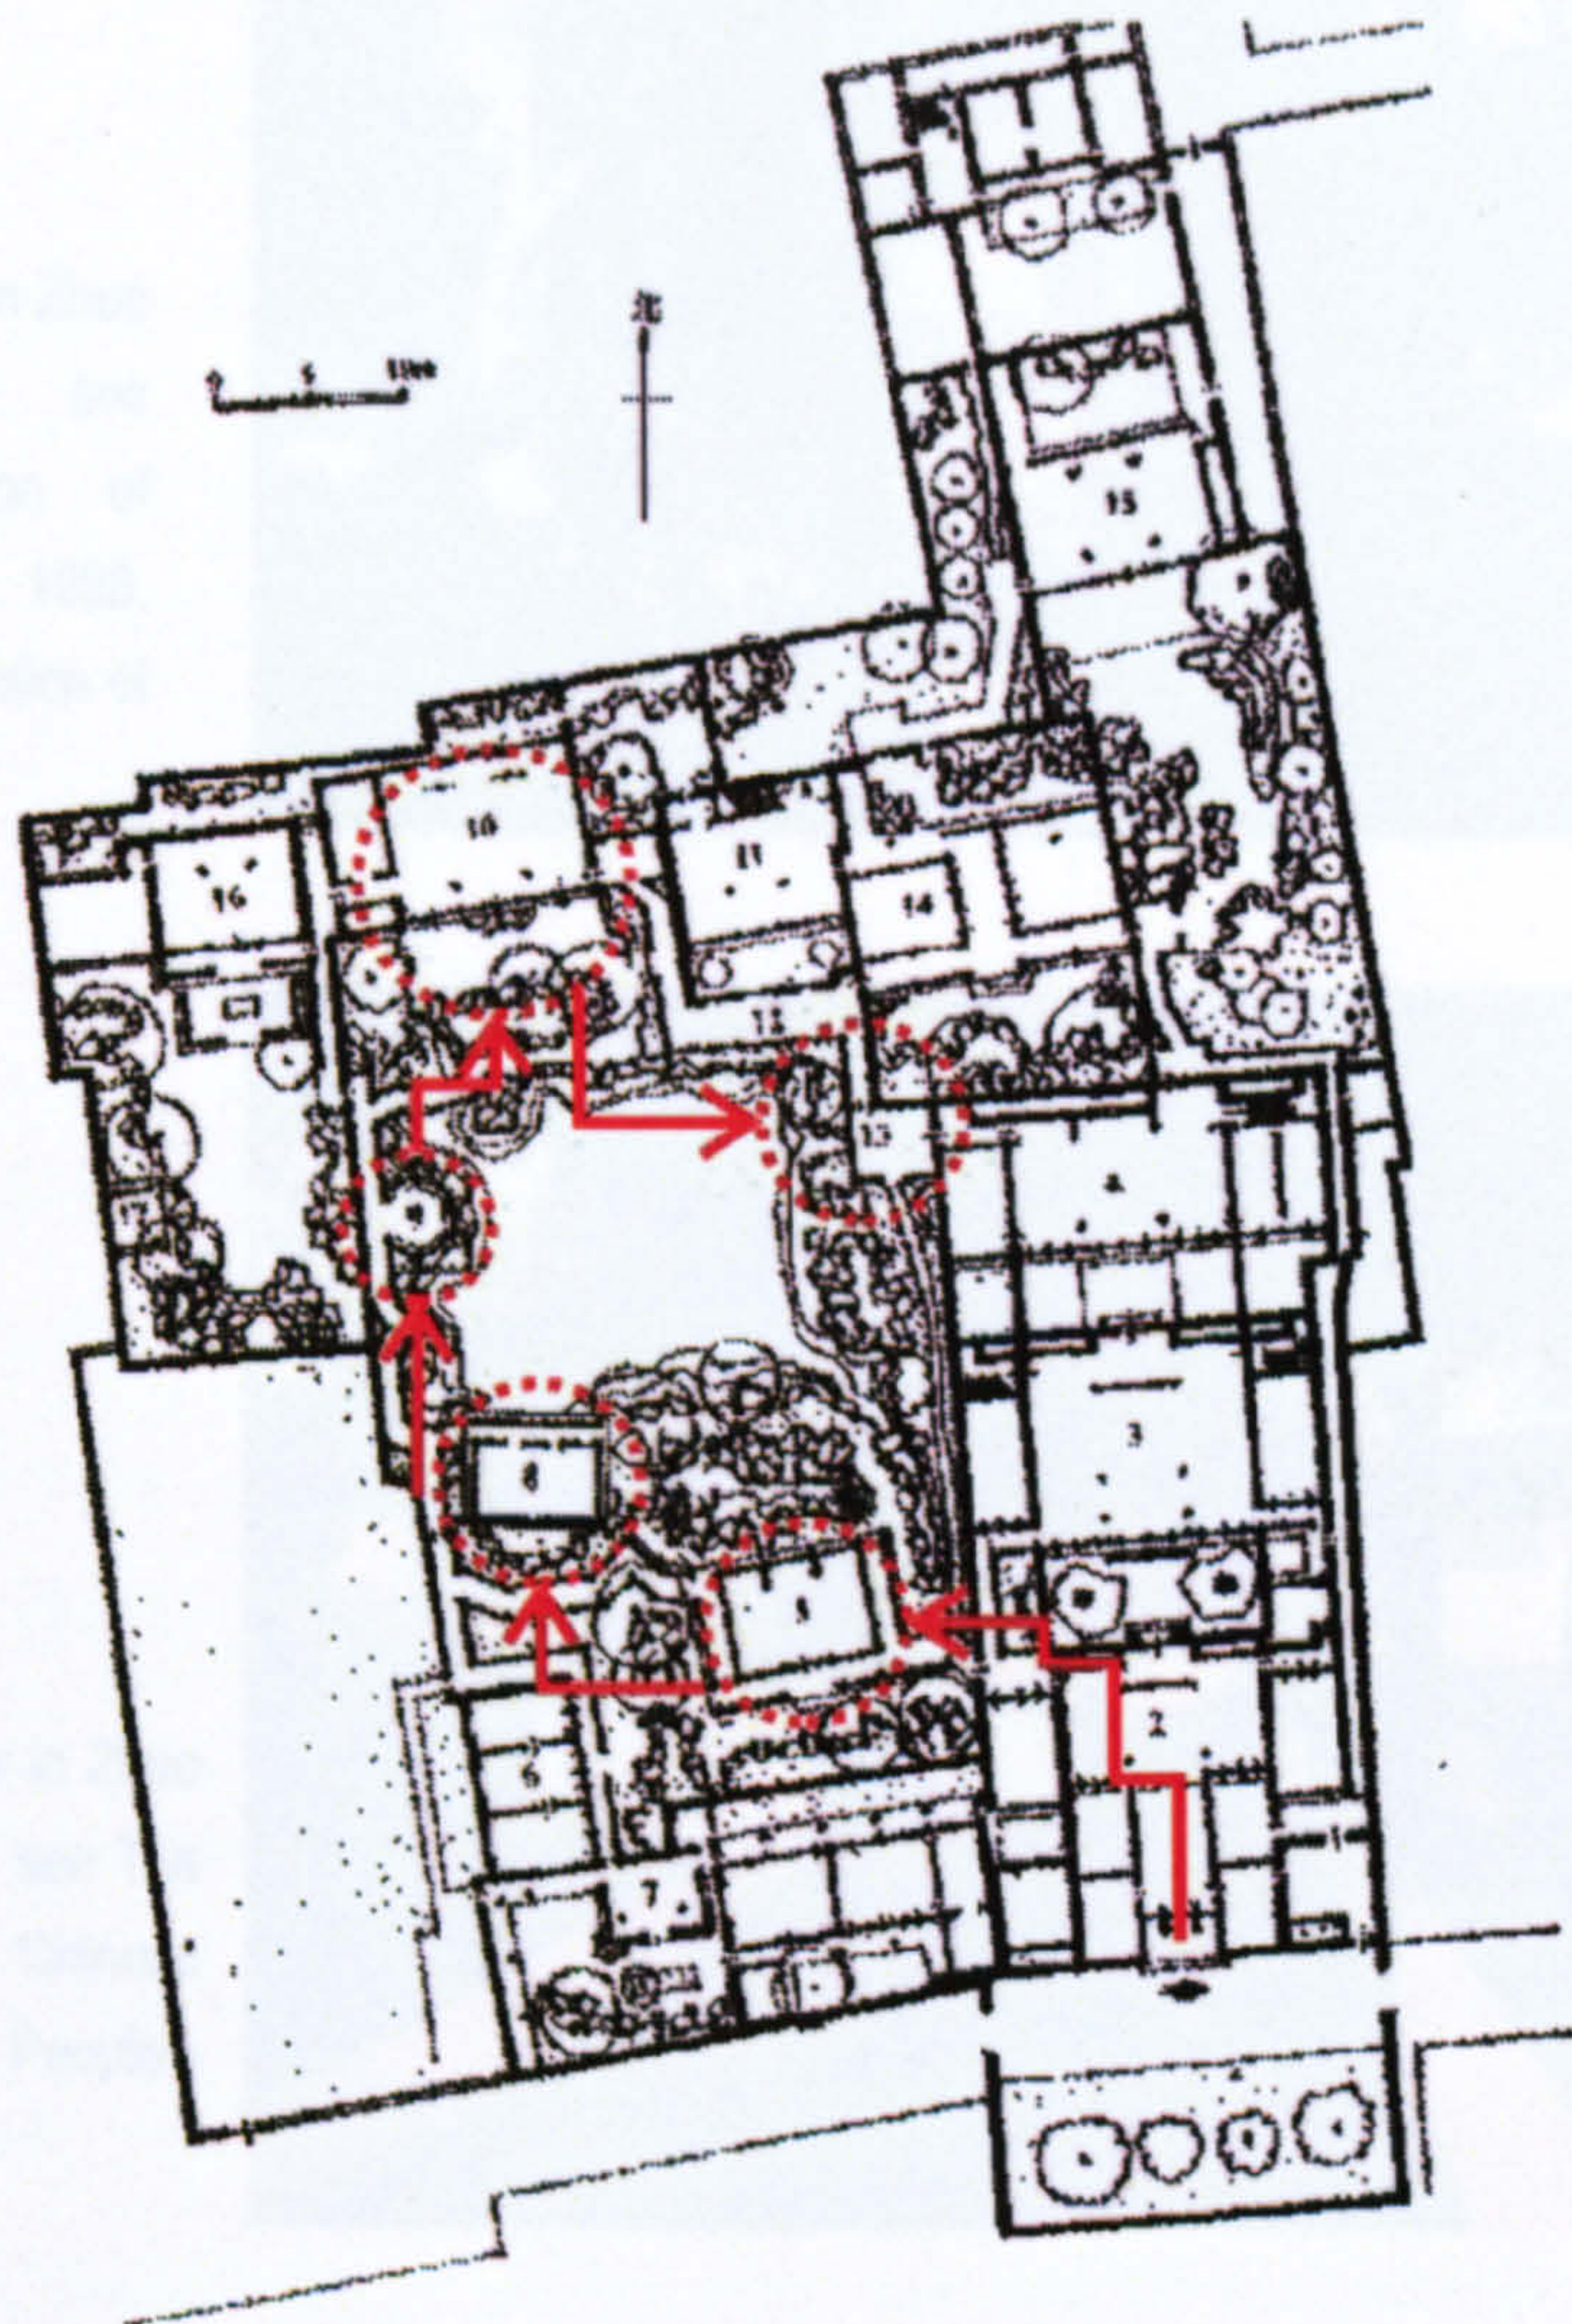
The Connection between Spots by Paths, Corridor and Bridges in Wang Shi Garden
